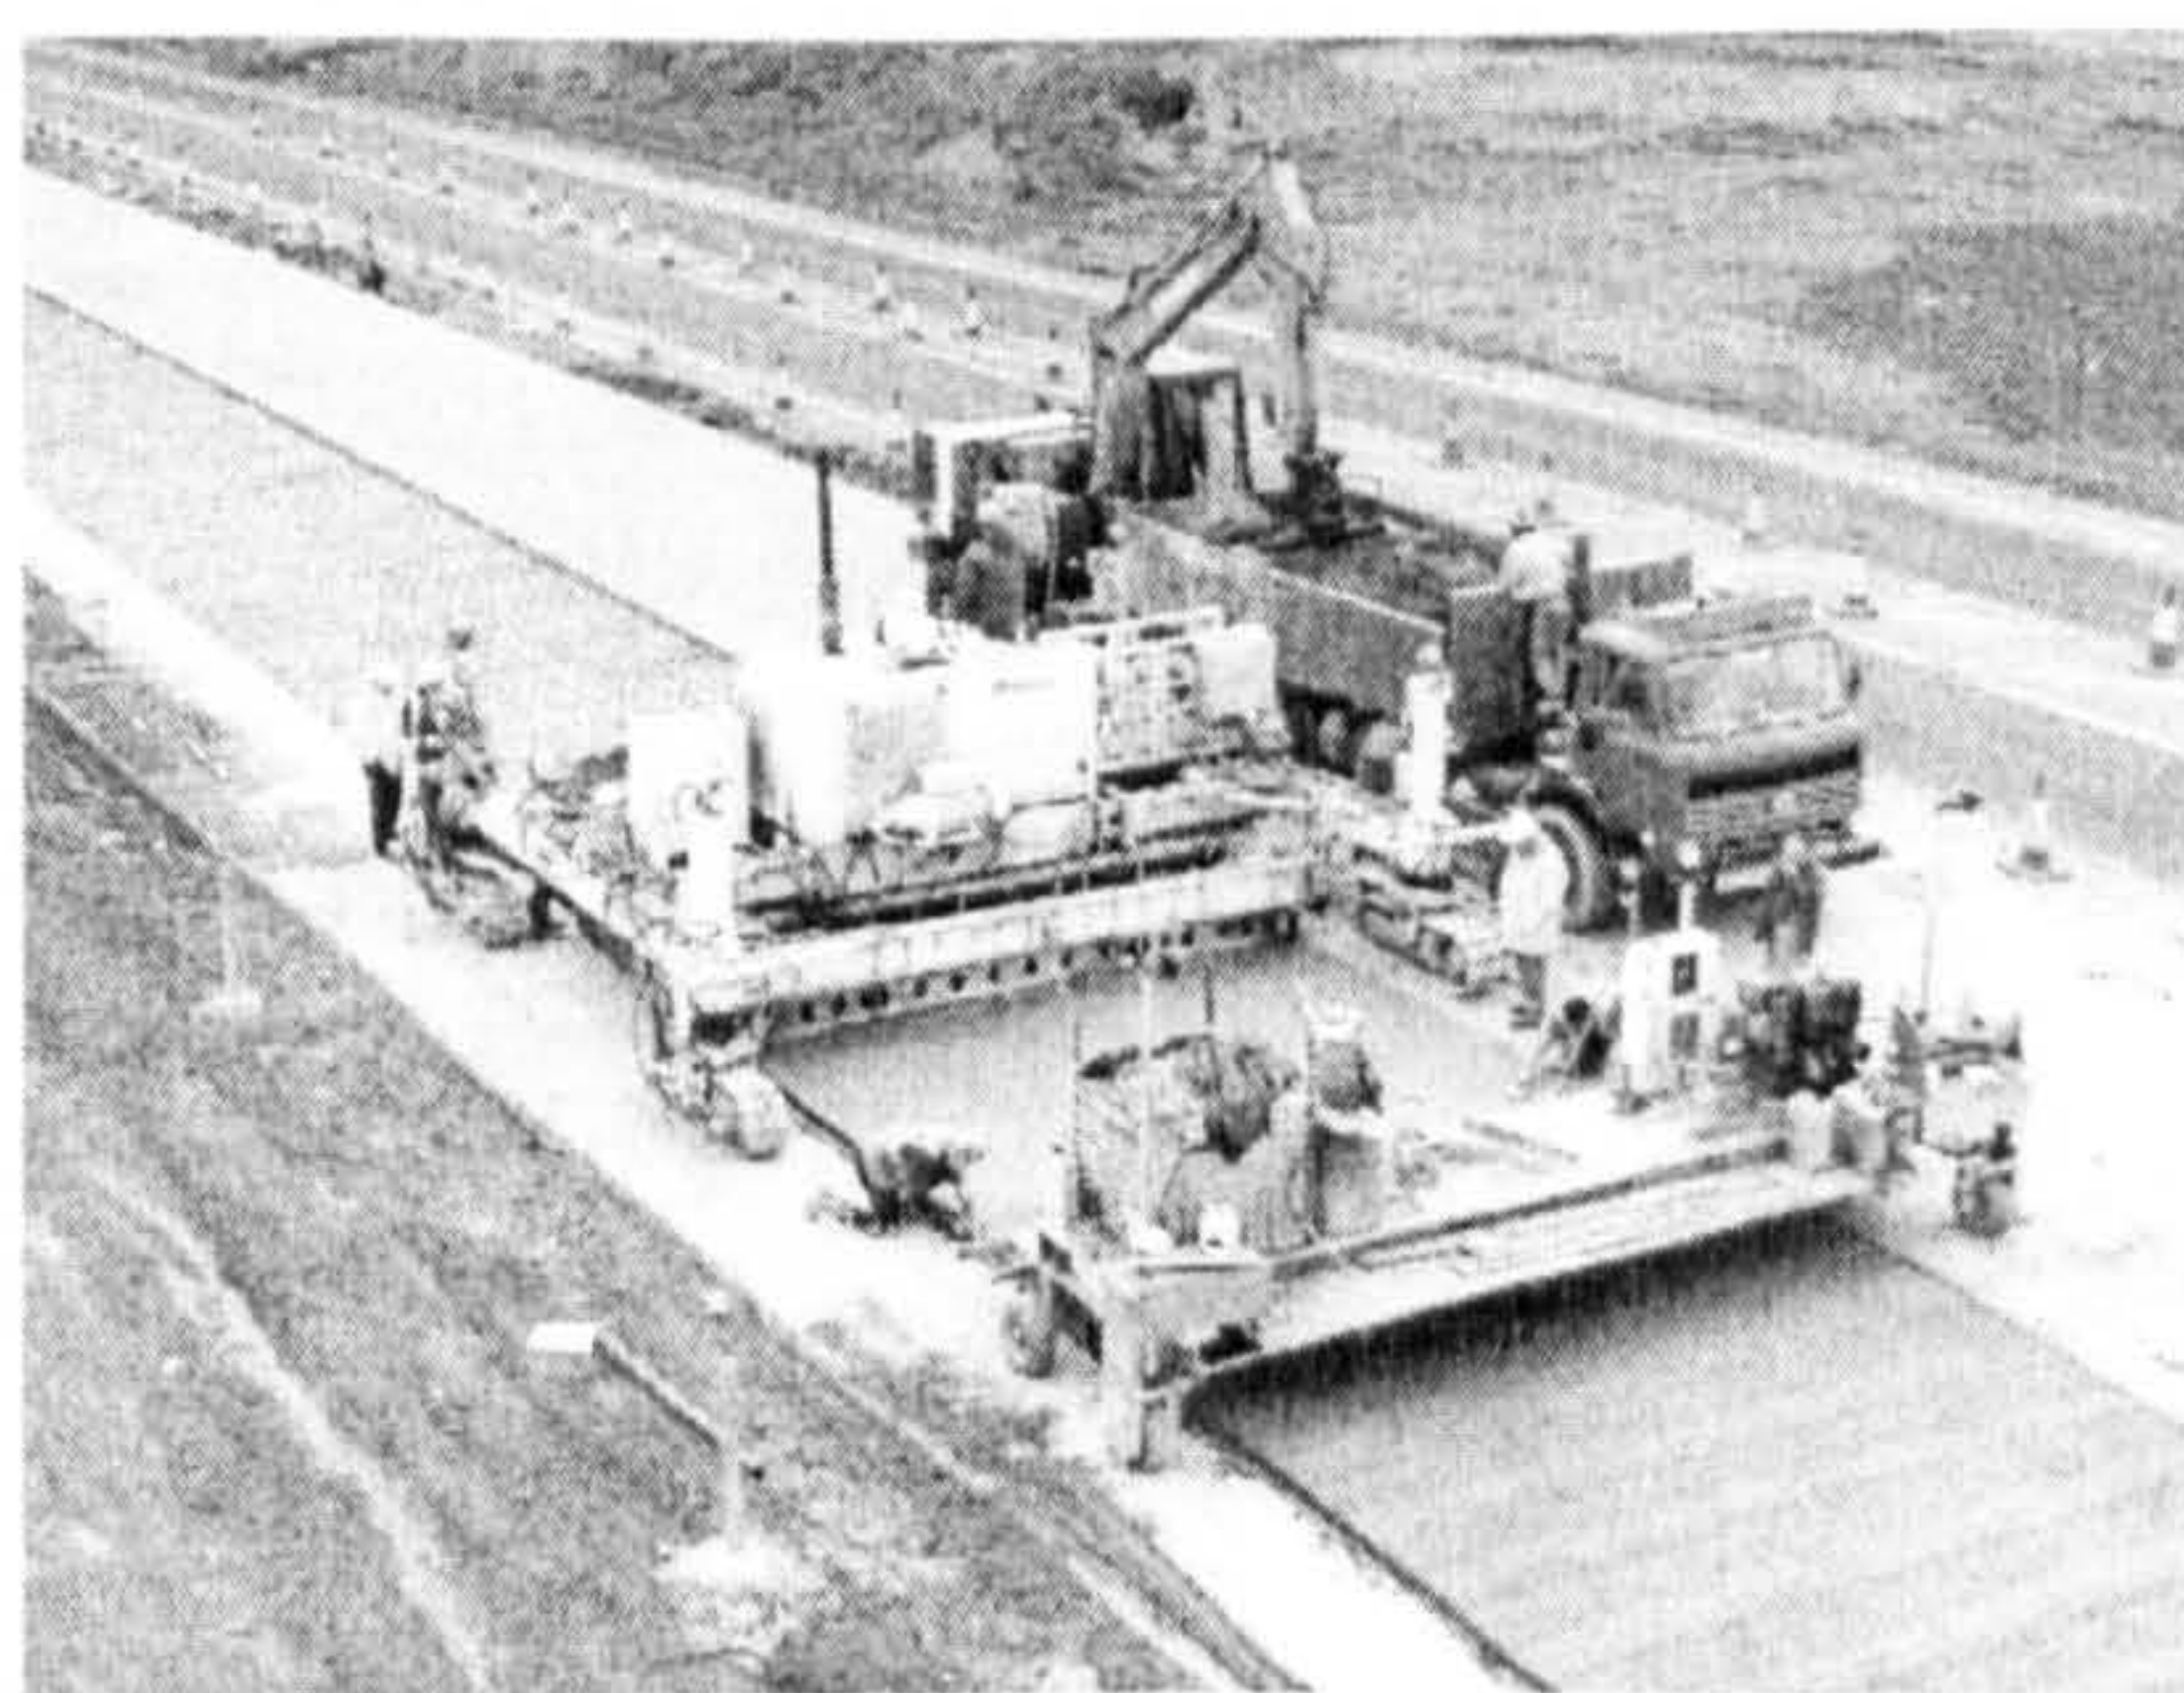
Rigid pavement slip form construction (Wirtgen 2001)
